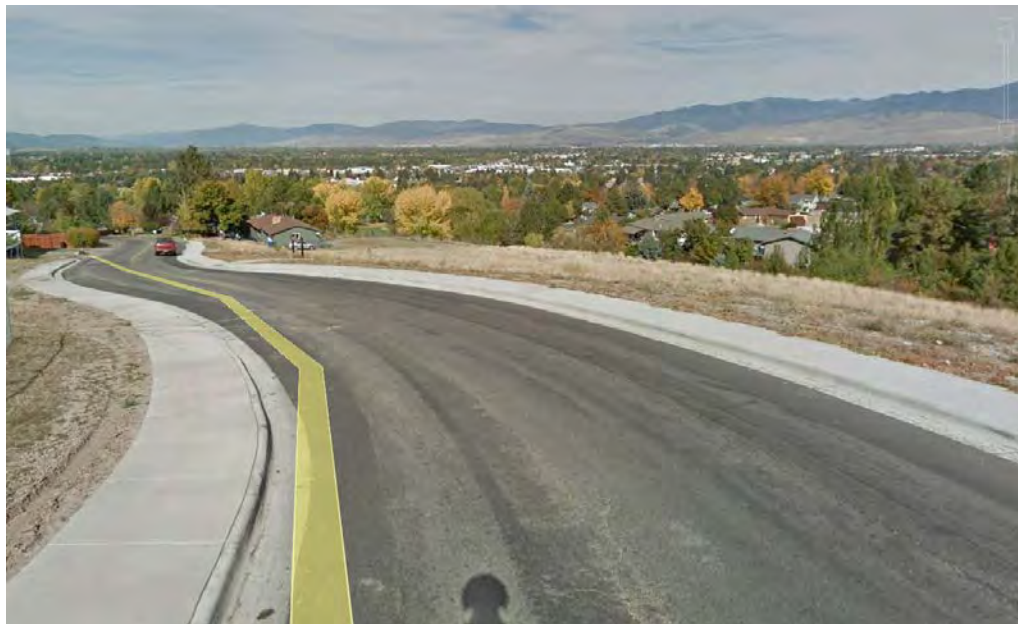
Looking south on 23rd Avenue just past Foothills Court
